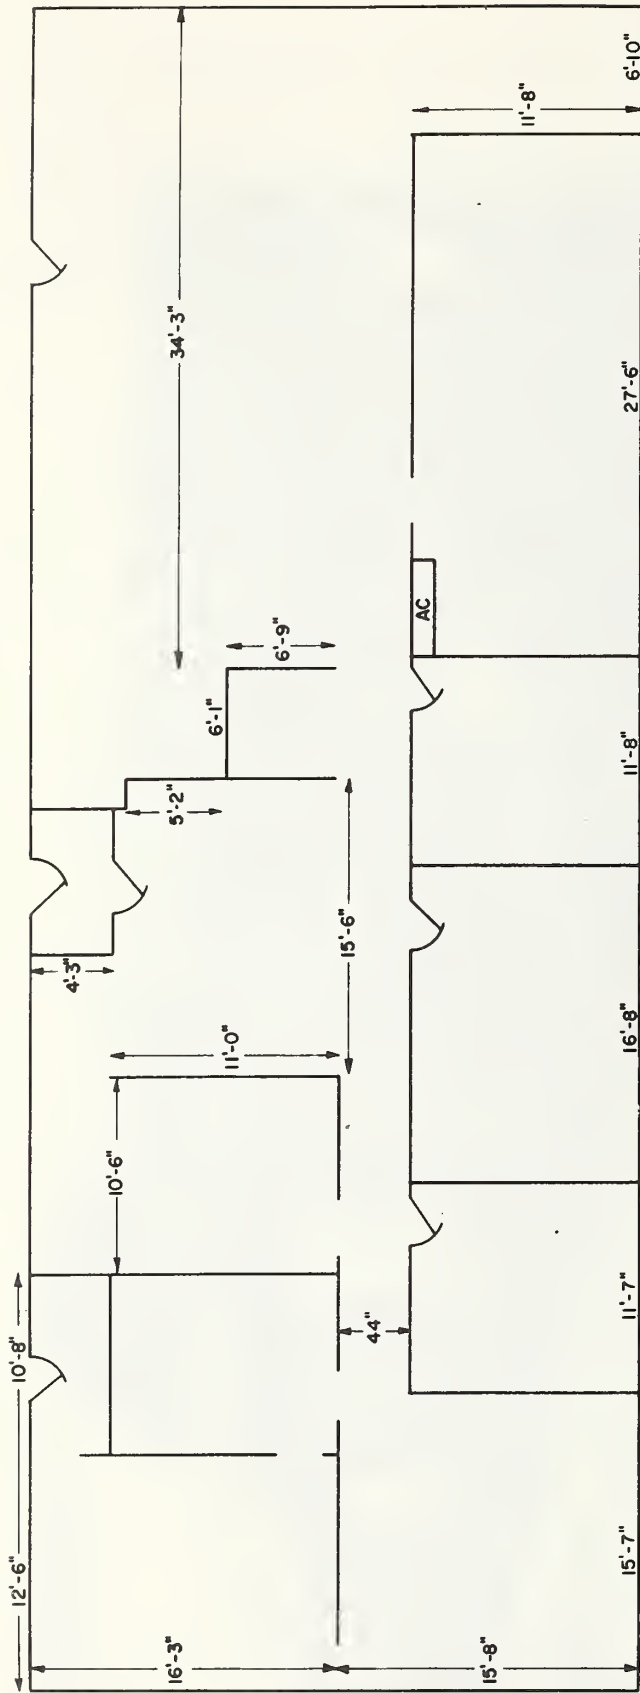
Floor Plan and Air Conditioning Duct Work of Building 219. Duct Work is Located Along the Ceiling of the Corridor. (See Section 10 for Conversion to SI Units.)
